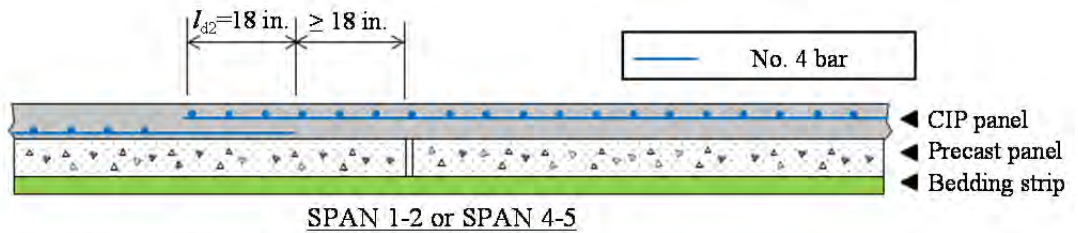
Details of longitudinal splices, Lampasas River Bridge (Sections B-B and H-H)
